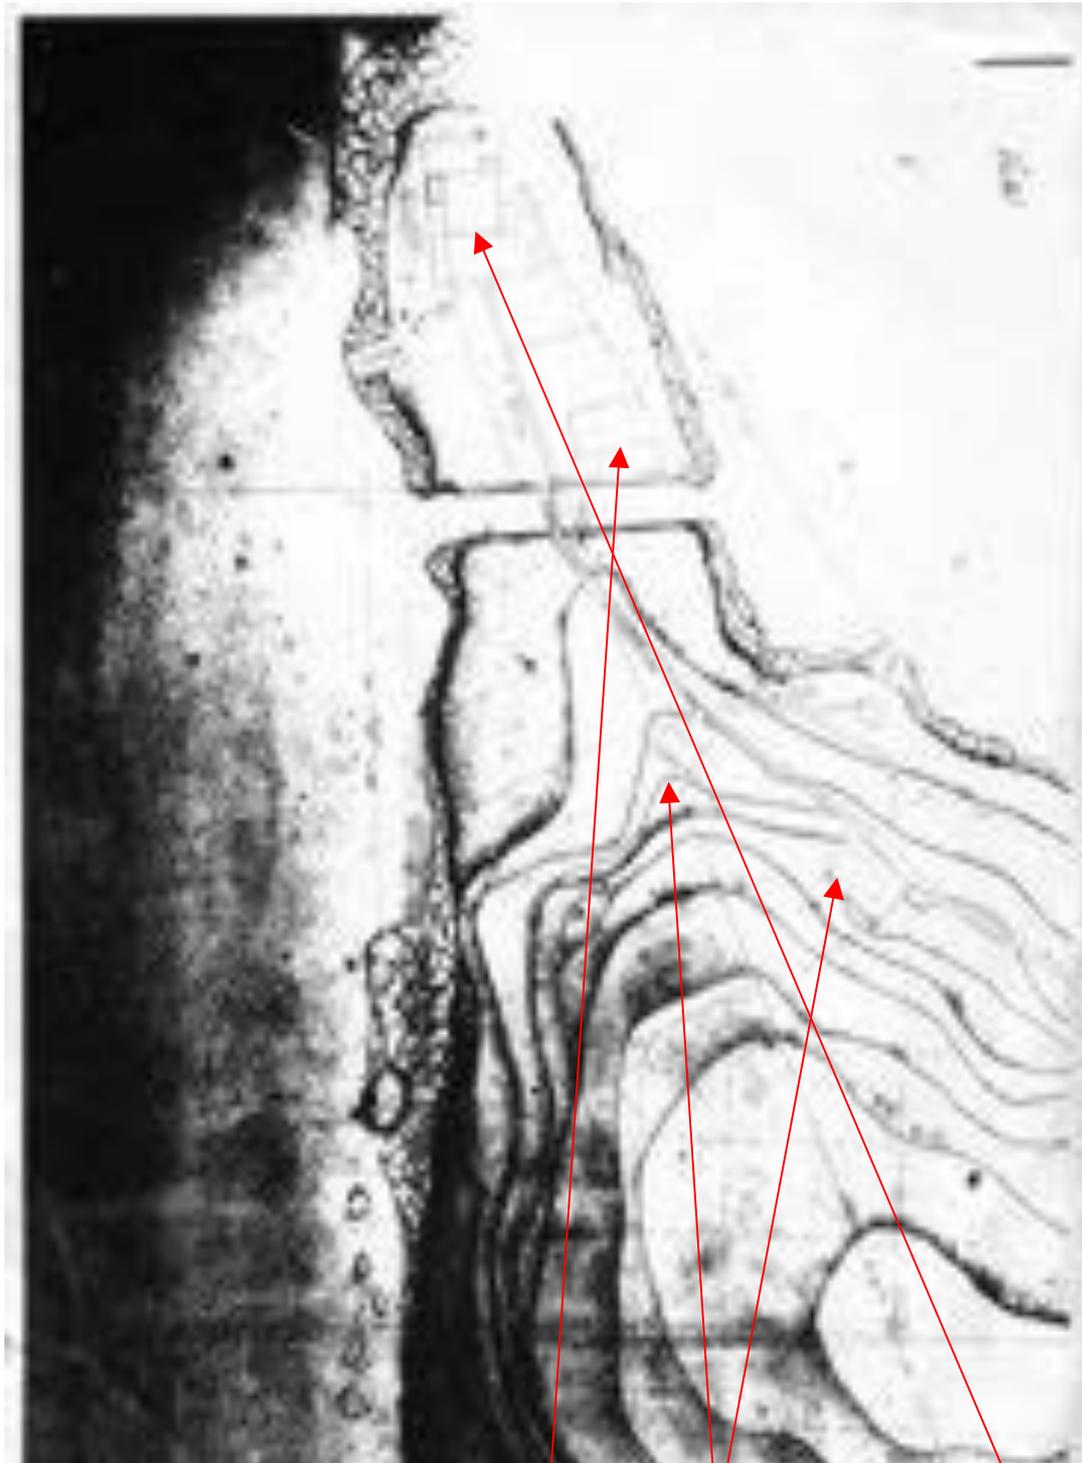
The 1891 plan of the north-east end of the island. The buildings evident in this plan are the former 1838 Water Police Building, by this stage with additions and outbuildings, the 1865 cottage and the 1875 magazines and store building. There is a stone jetty to the north of the water police station and the Cut is clearly shown as is the original shore line with its rocky outcrops. This jetty is now behind the sea wall and fill area. It is likely that it remains in situ and it may form part of the current sea wall. A second small jetty is on the southern side of the island, below the later magazines and with a small store building possibly of timber construction. It was removed in the early years of the twentieth century and there is some evidence of its location on the cliff face. The plan also shows a bridge over the cut (probably at a lower level than the present bridge based on site inspection) the main path connecting to the magazine precinct (Magazine Walk) and ancillary paths and fences. Interestingly the change of alignment in the Walk adjacent to the larger magazine is still evident in the path alignment.
